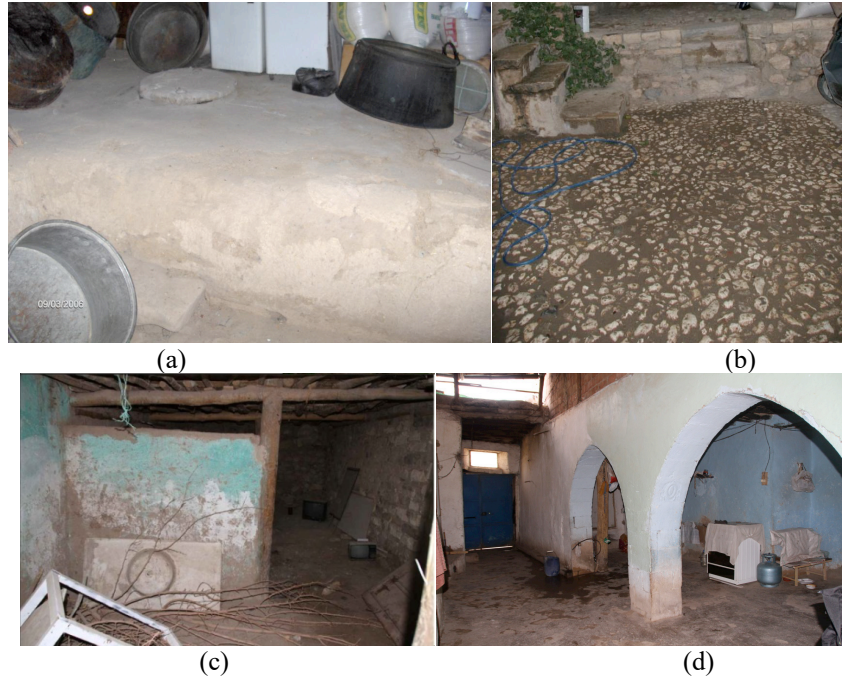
Ground floor Slabs in Hüseyinik houses: (a) a tandoori house with compacted soil; (b) the courtyard with a stone paved floor; (c) a barn with compacted soil flooring; (d) an iwan with a screed floor
